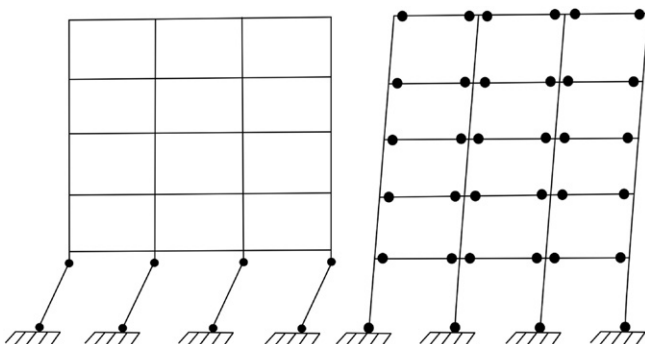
First soft-storey failure against “weak beam-strong column” mechanism.
